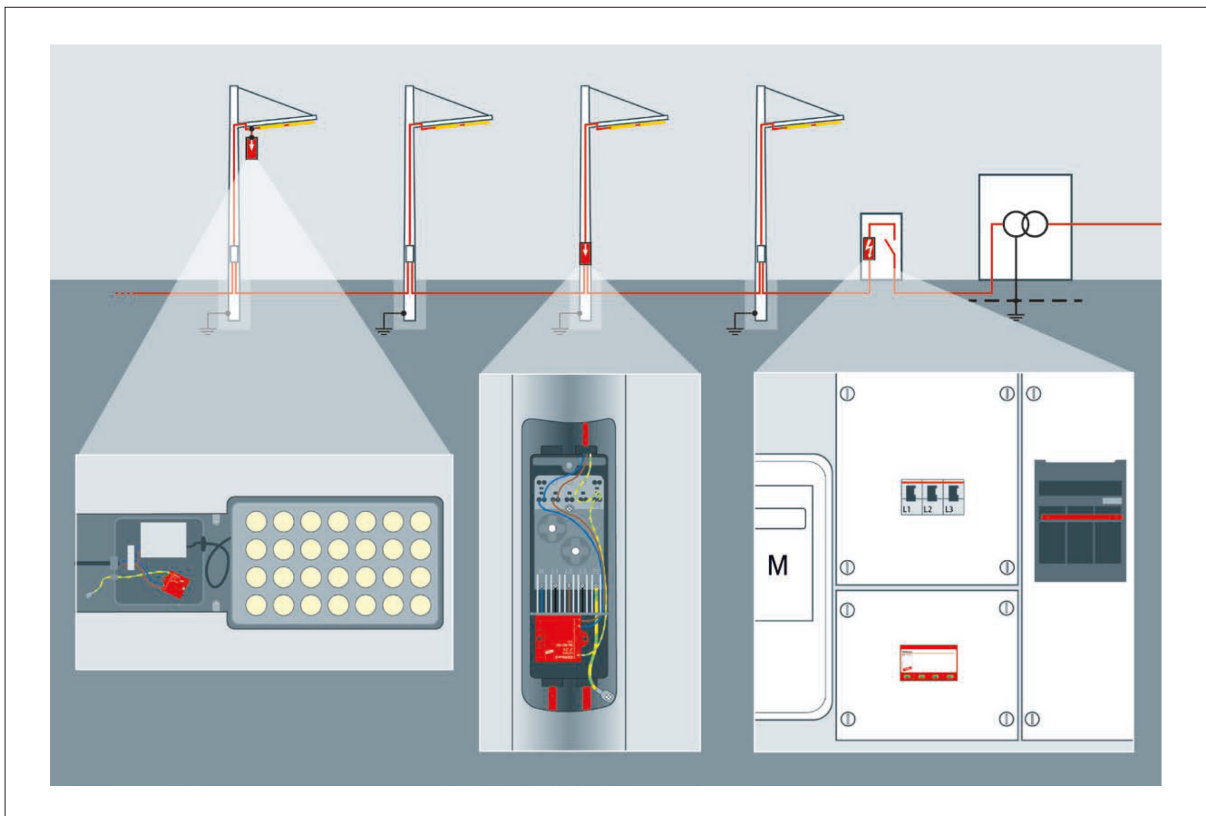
Typical exterior lighting installation showing the location of SPDs
